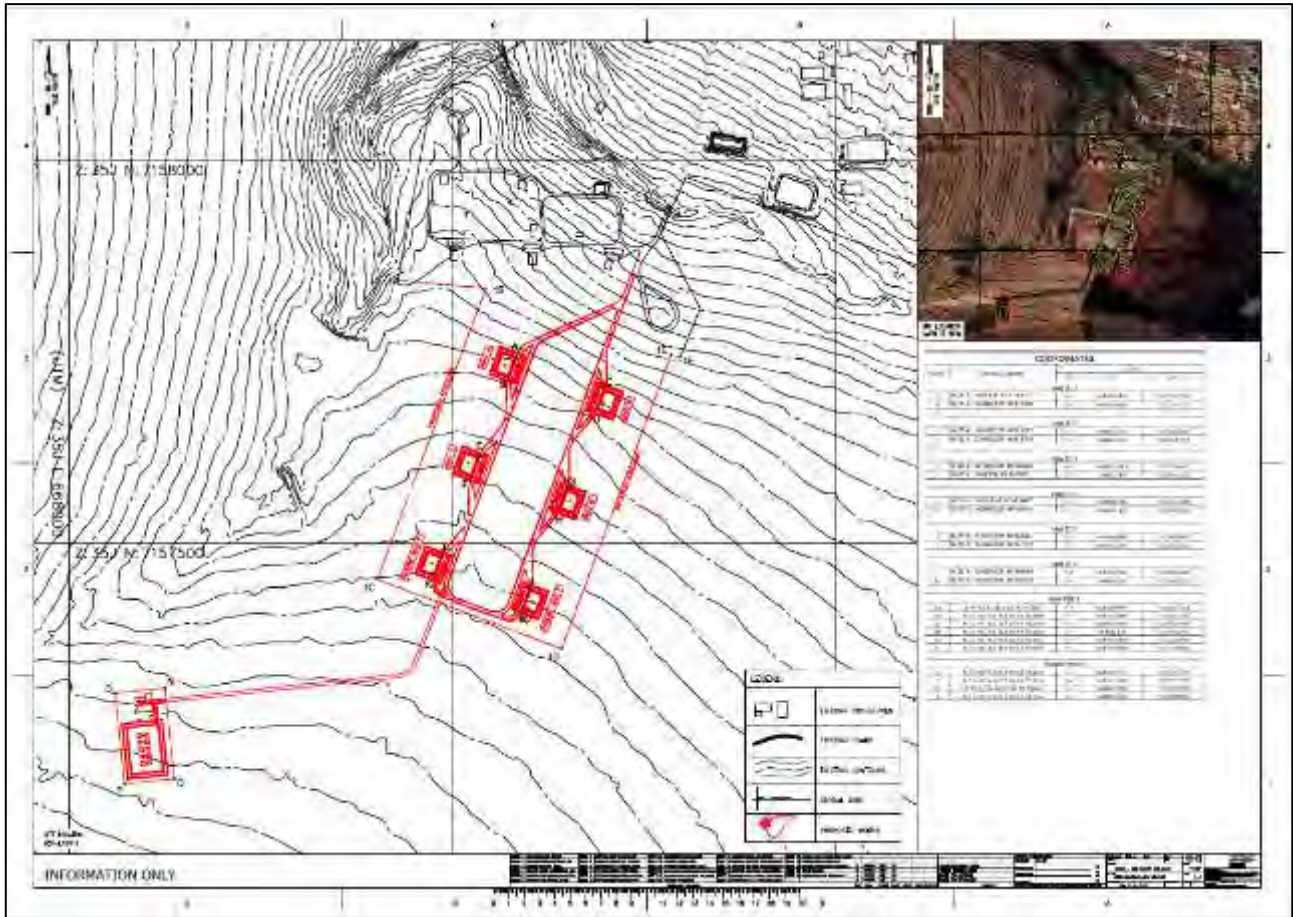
Design layout detailing the proposed Magazines and Shooting Bay area.
